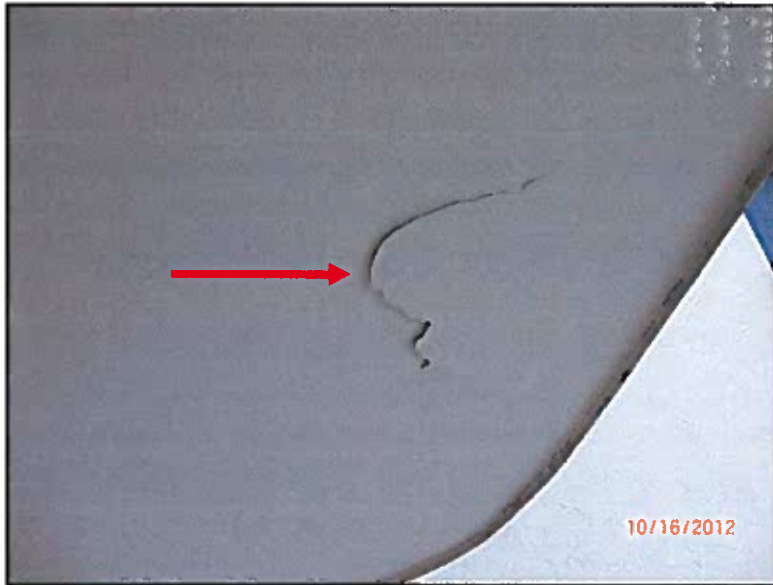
Concrete spalling at balcony ceiling at Unit #416
